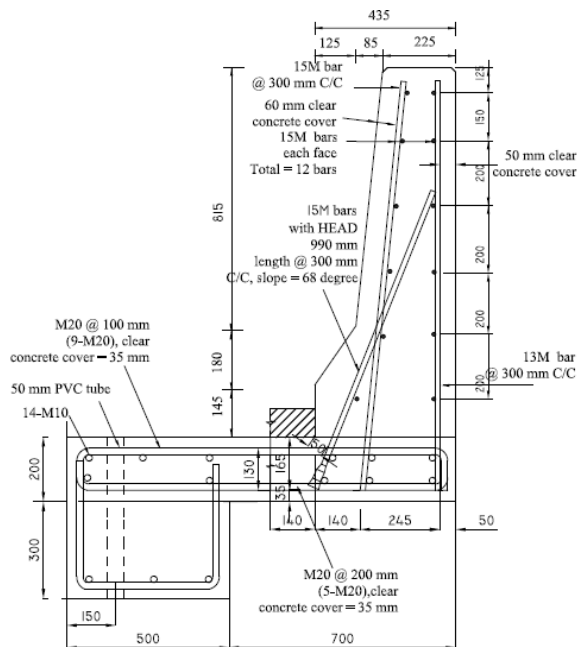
Cross-section of specimen S-1 for interior portion of the barrier resting over deck slab cantilever
